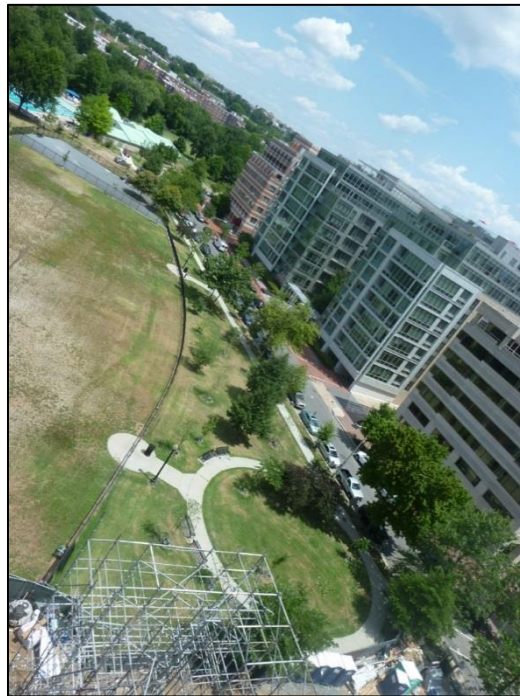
View to Northeast with 25th Street NW Buildings*, July 2, 2017.
